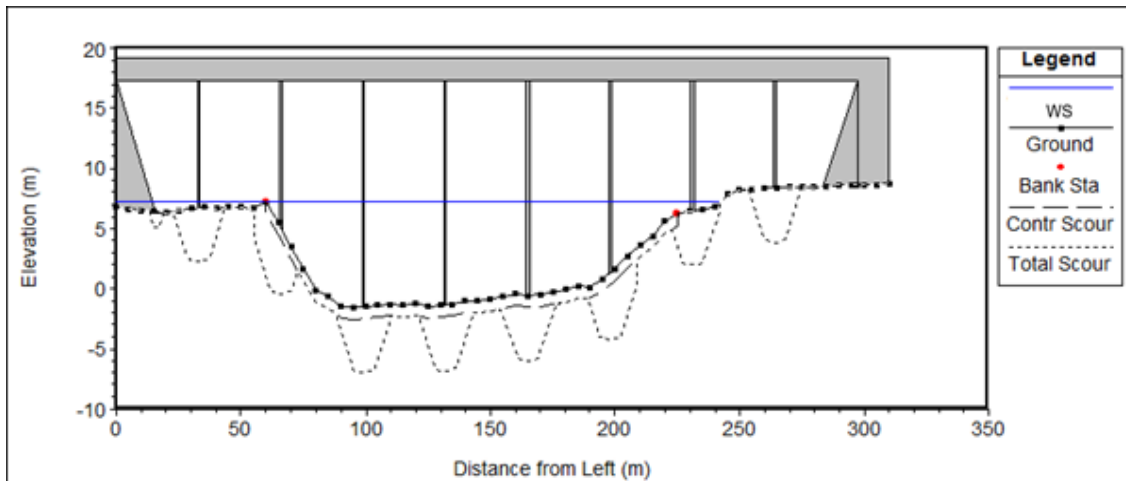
Variation of pier scour at the Manikganj Sadar Bridge under design condition with HEC-RAS model [the maximum local scour is found to be 4.47 m, with 1.5 m pier width, 4 August]
